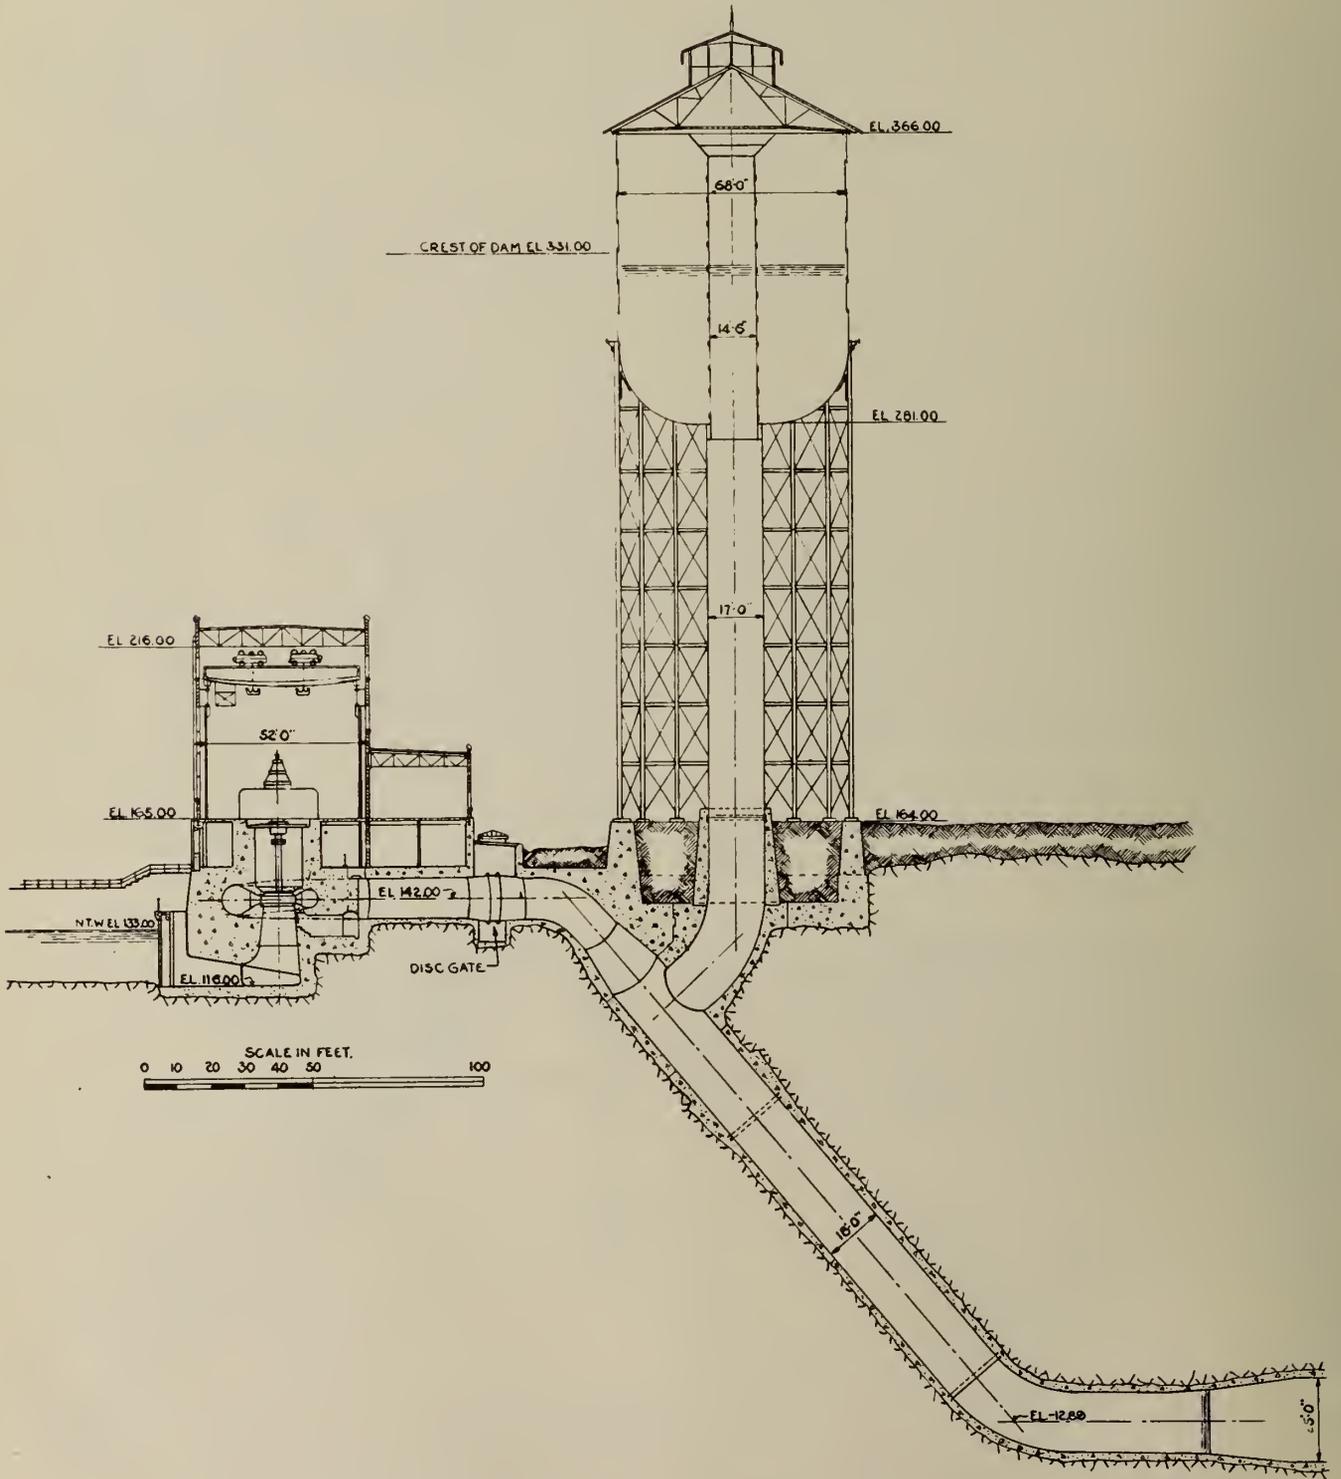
Section Through Power House and Surge Tanks at Masson.
